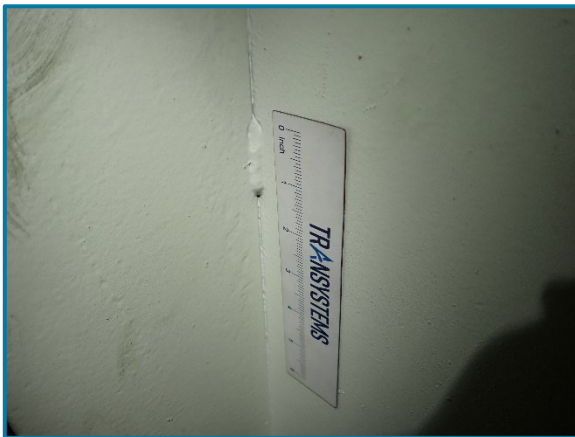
Typical tack weld between the transverse stiffener and web plate (looking southeast on the interior of Pier Cap 3A).
